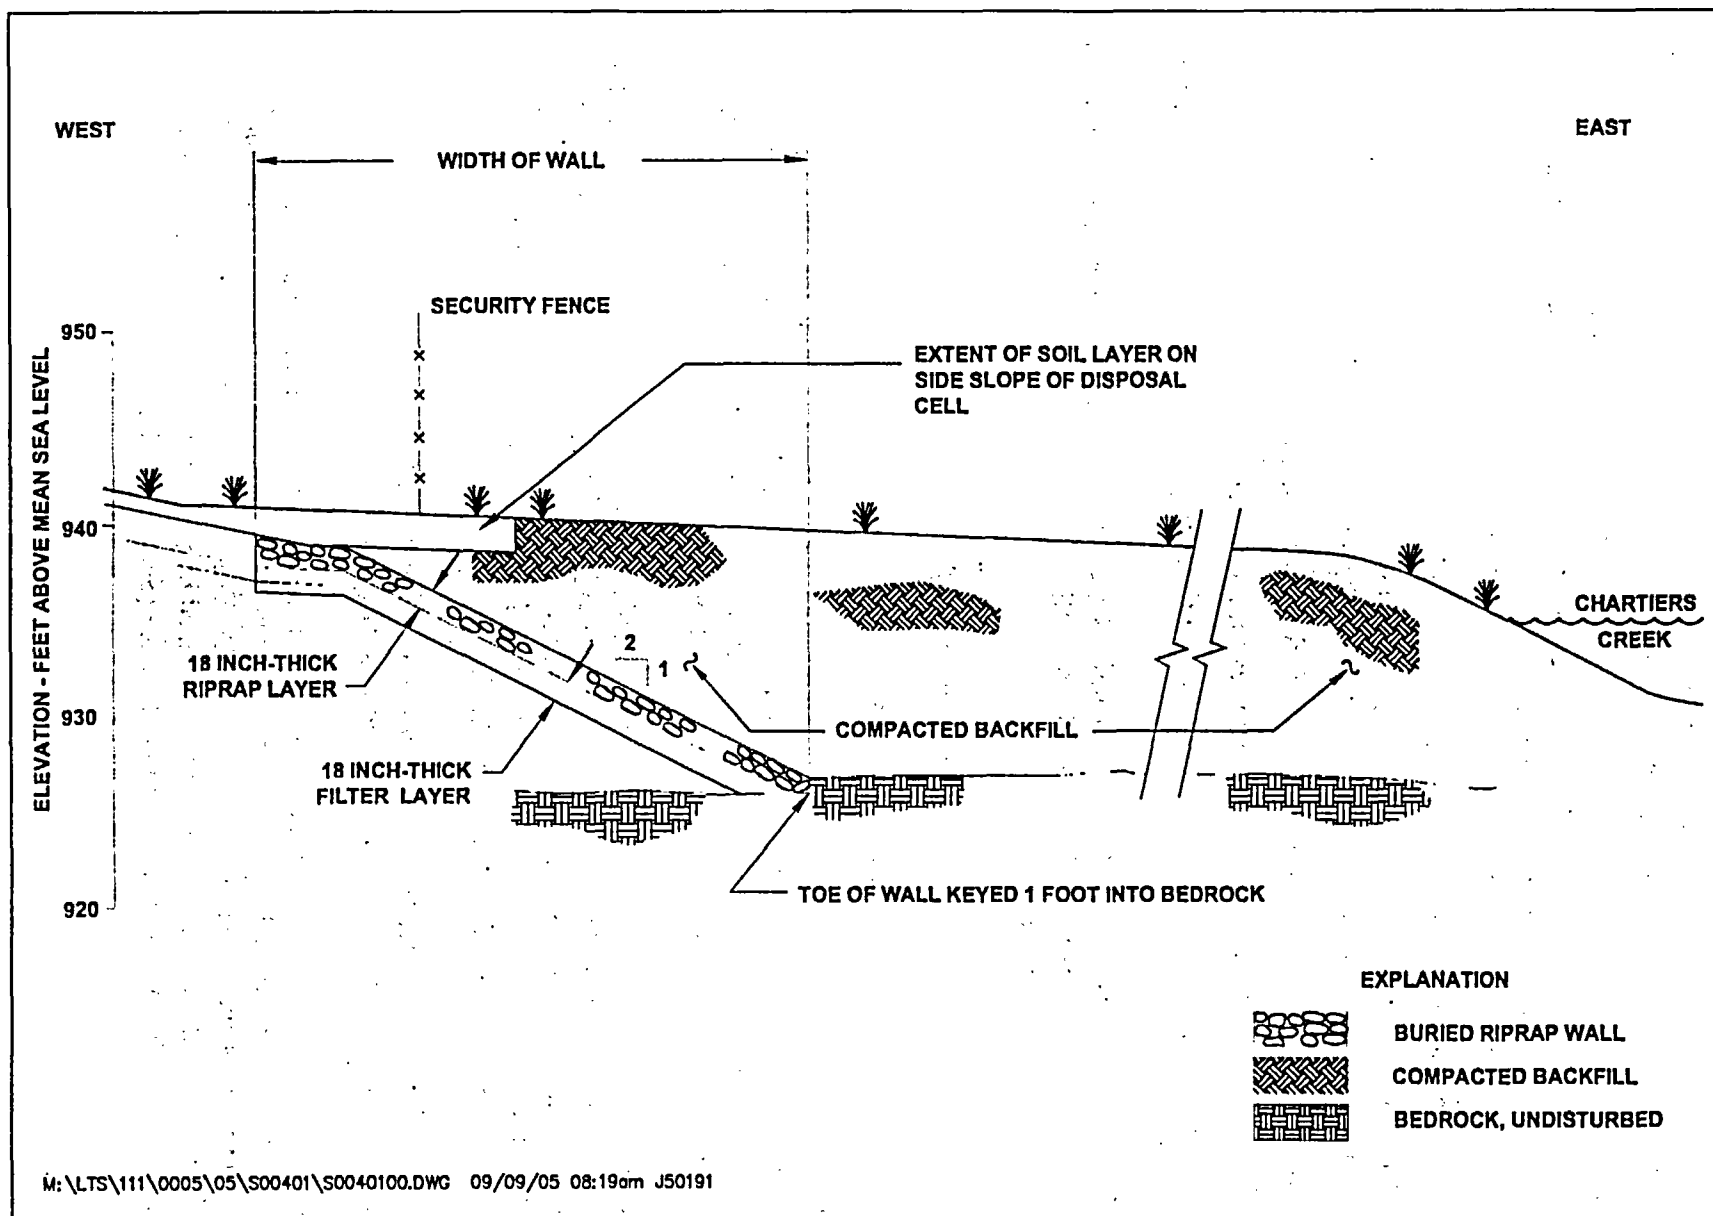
East-West Cross-Section Through Buried Riprap Wall, Canonsburg, Pennsylvania, Disposal Site
